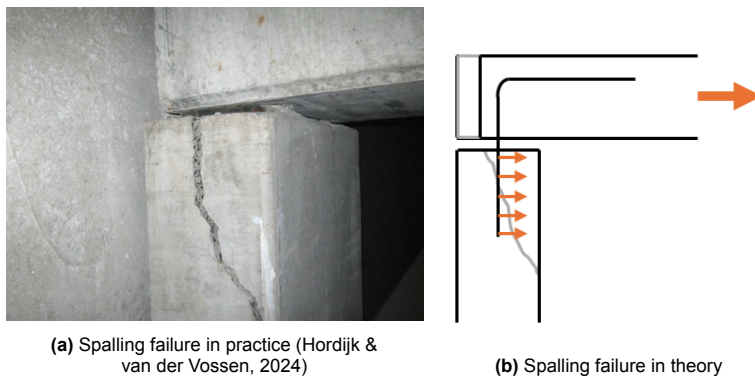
Spalling failure due to restricted uneven deformations
